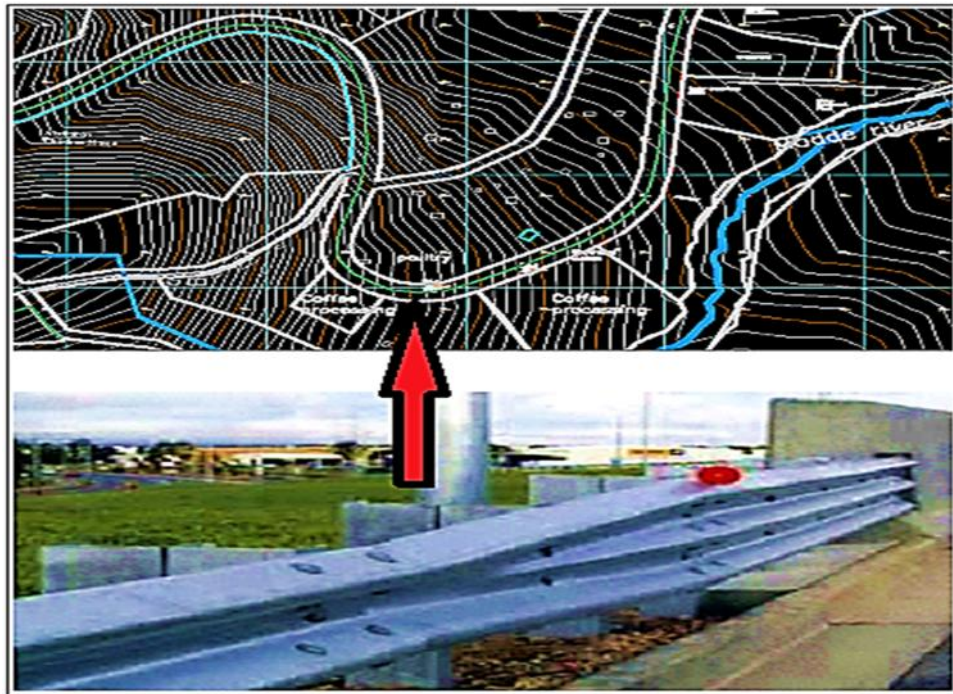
Recommended lighting column and protective guardrail, “Sor-bridge”
